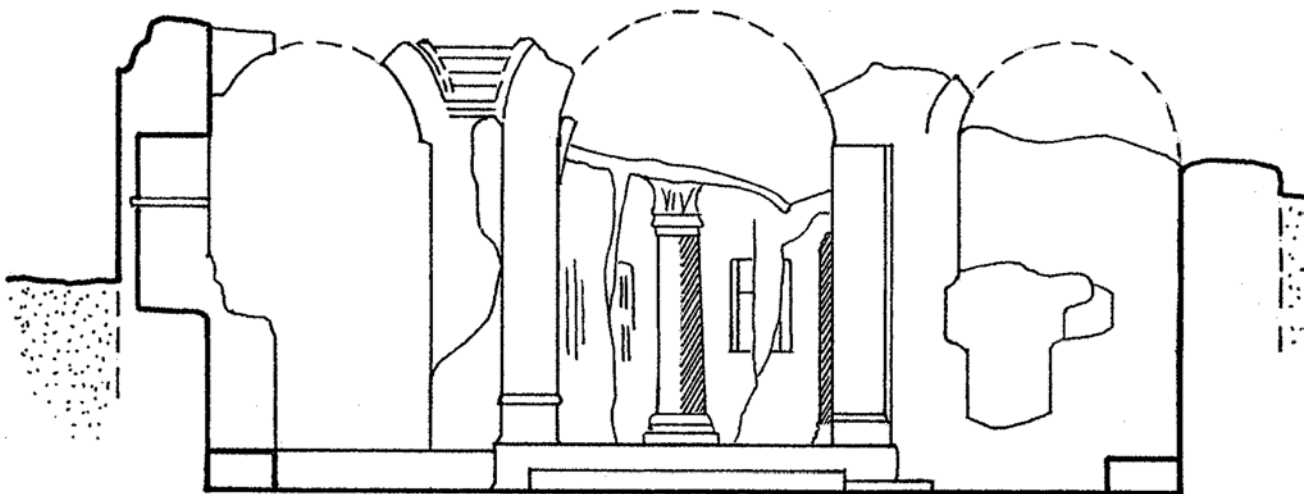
Ismant el-Kharab. Small East Church, north-south section (CC) through the east end (drawing B. Rowney).
